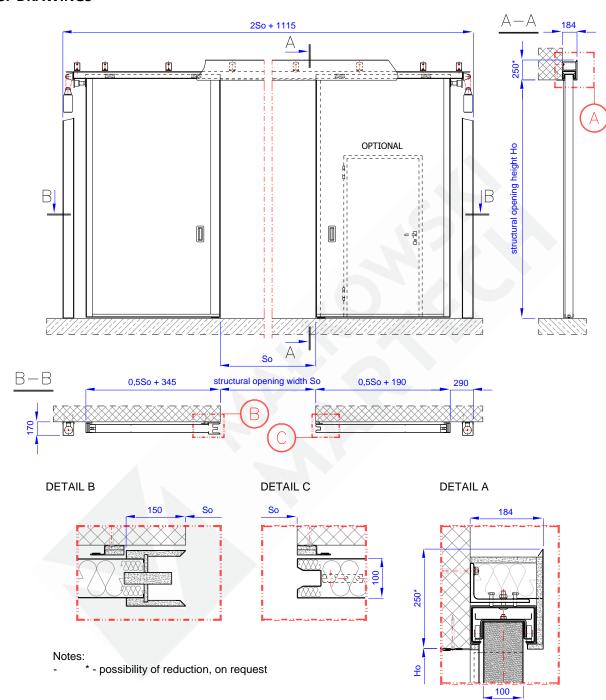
Fire protection bi-parting sliding door MARC-R EI120
